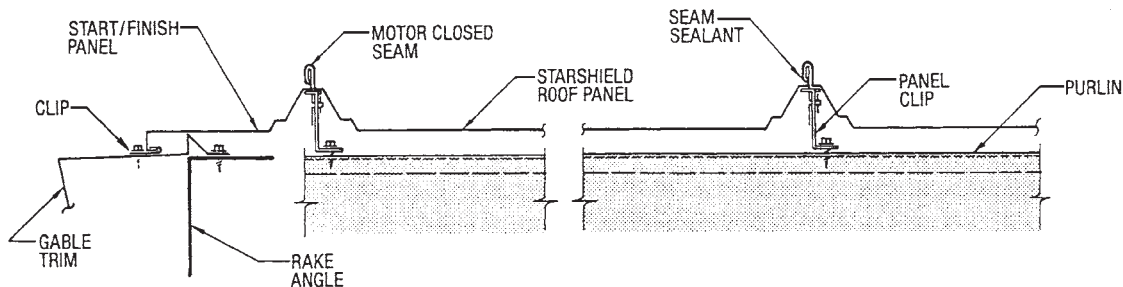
Sliding connection of structural roofing with trapezoidal profile to gable trim at the rake. (Star Building Systems.)
